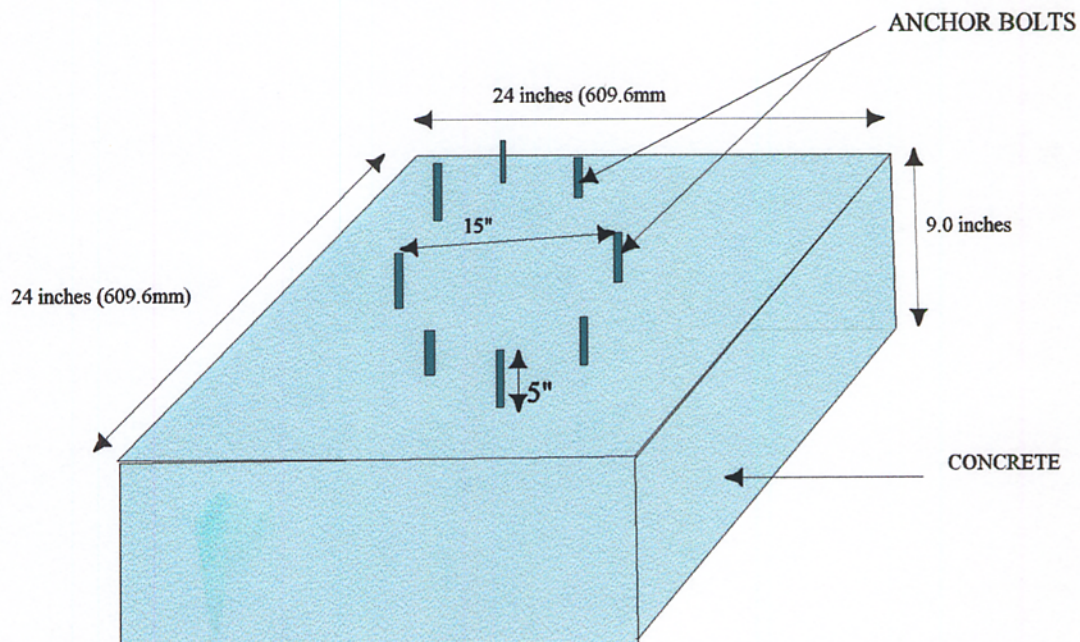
Foundation of Base Plate Arrangement with inserted Bolts.
